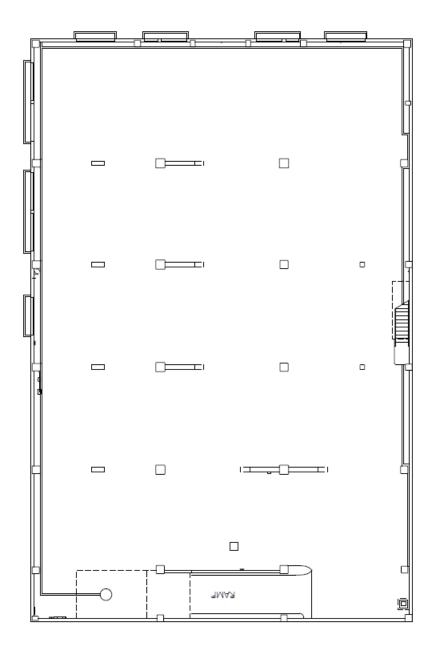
Existing Basement Plan. Courtesy of Open Studio Architecture. N 👚
